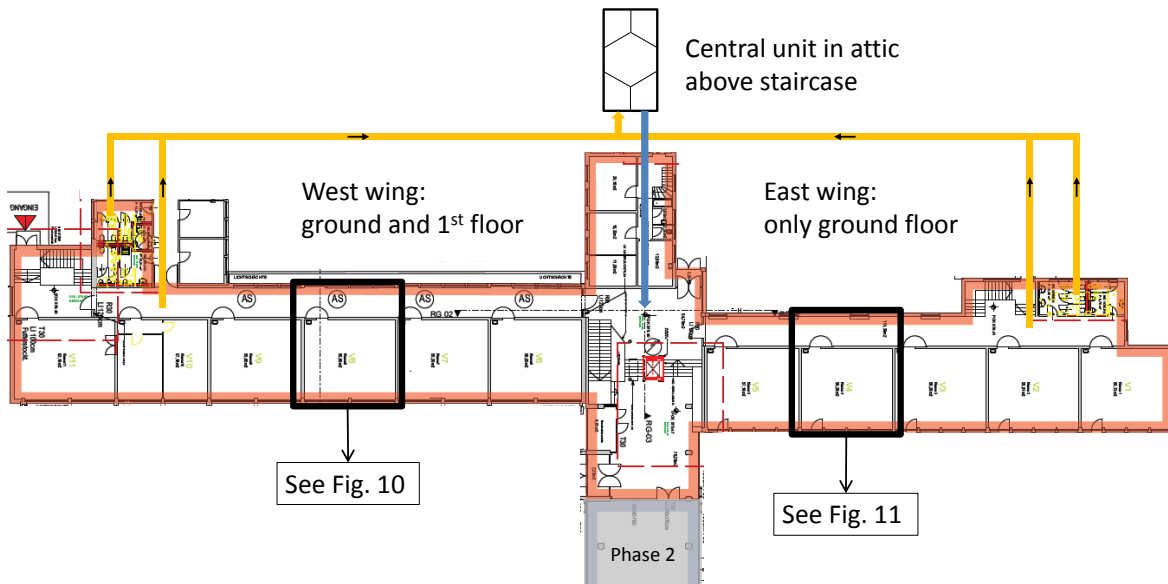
Floor plan of the Siegmairschule including a schema of the AOP as planned by Stiefmüller Hohenauer & Partner, Kundl, Austria (assigned HVAC planner).
